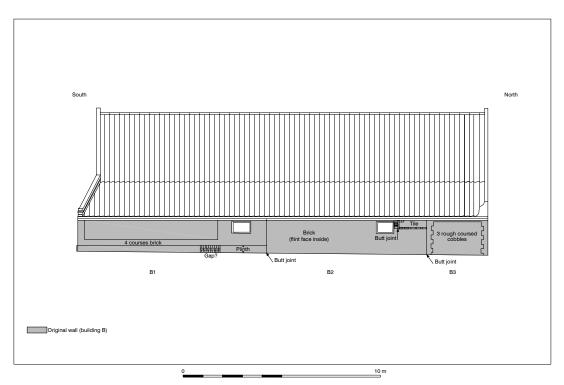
Aisled barn, east elevation. External. Scale 1:100.
